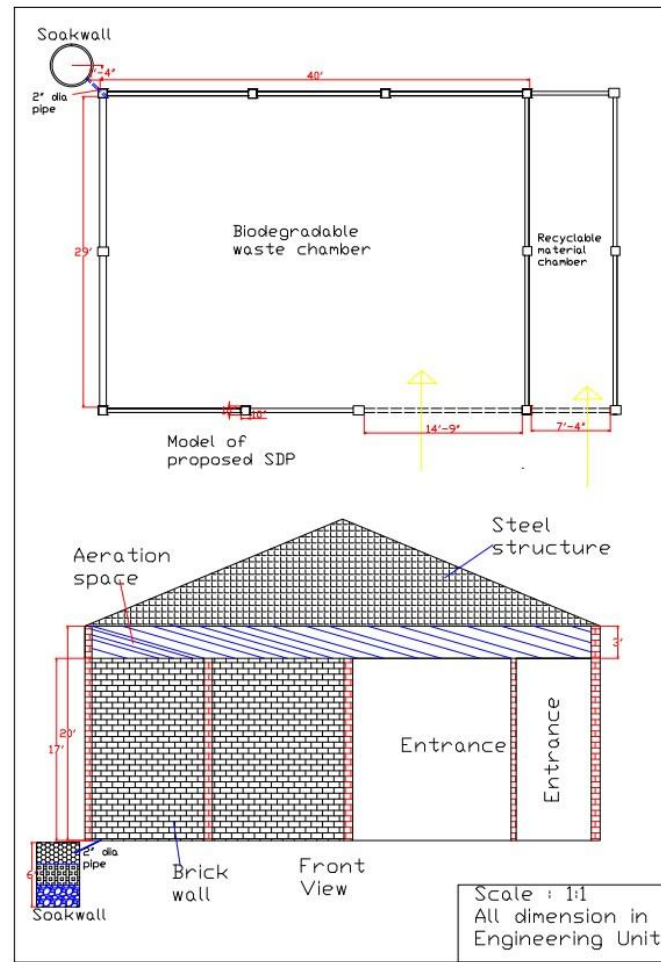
Proposed modified of open system SDP (separated chamber, surrounding wall, leachate treatment system and aeration process)
